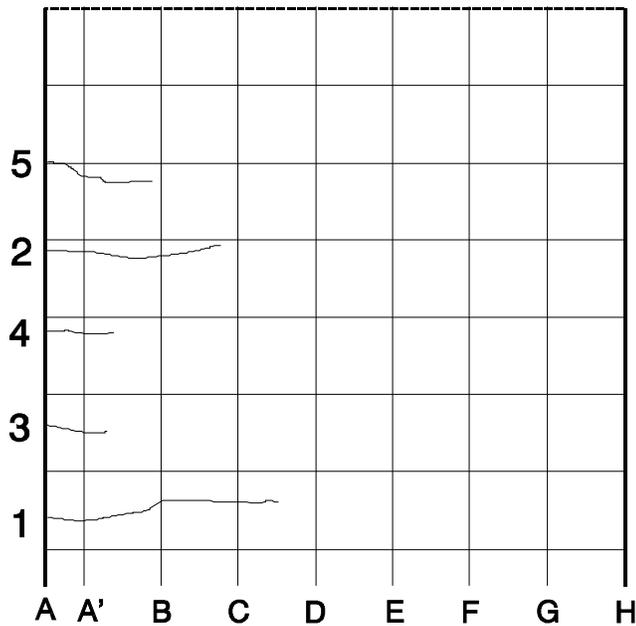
POJ-PU-54-TH cracking pattern on north face of pier at dead load
